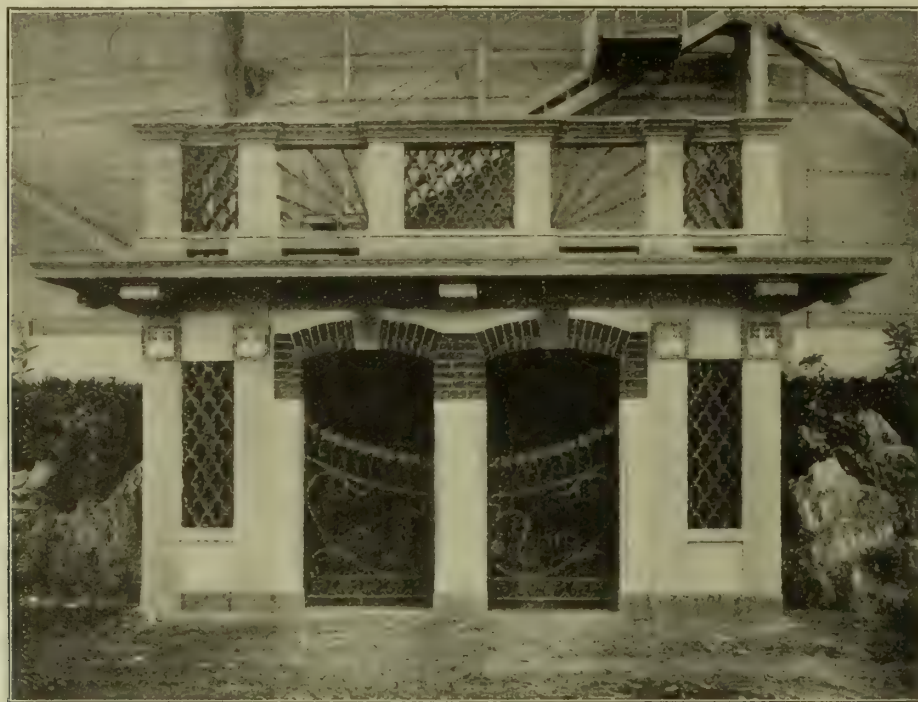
Elevation of the Dry Well containing the Inlet and Outlet Pipes of the New Gasholder.
